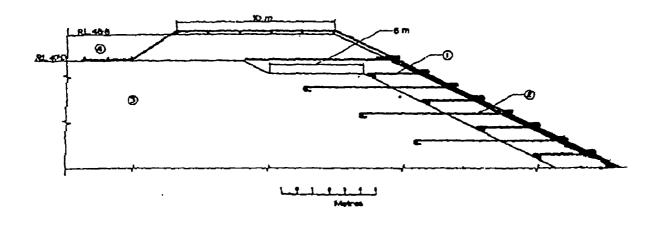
Ord River Dam – d/s Protection of Partially completed embankment
